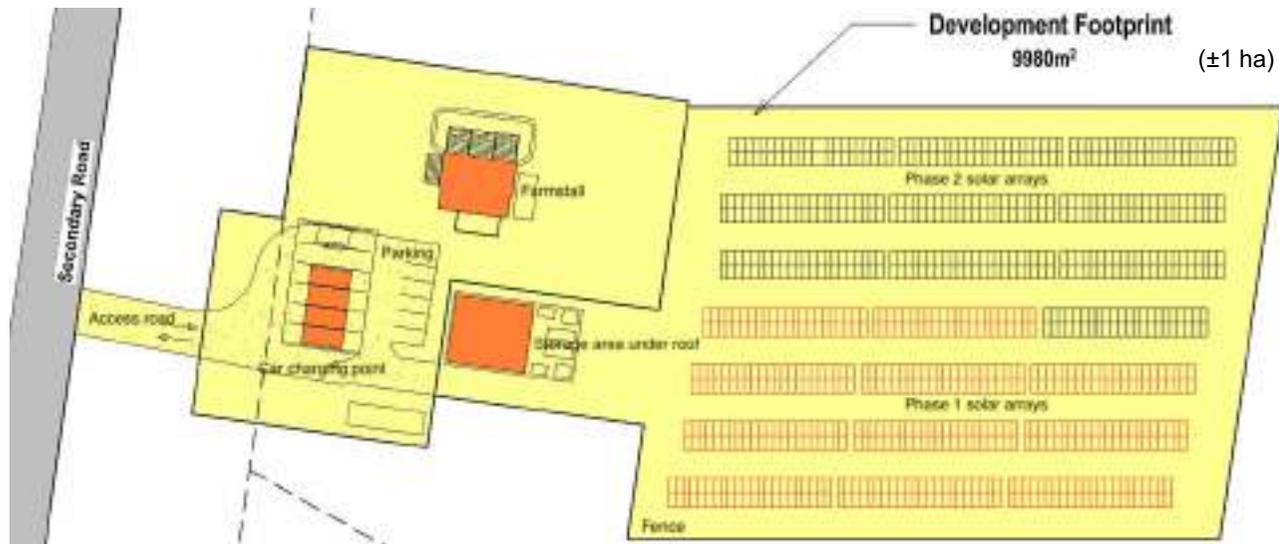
Typical site development plan for a 1 hectare car charging station and solar facility.
